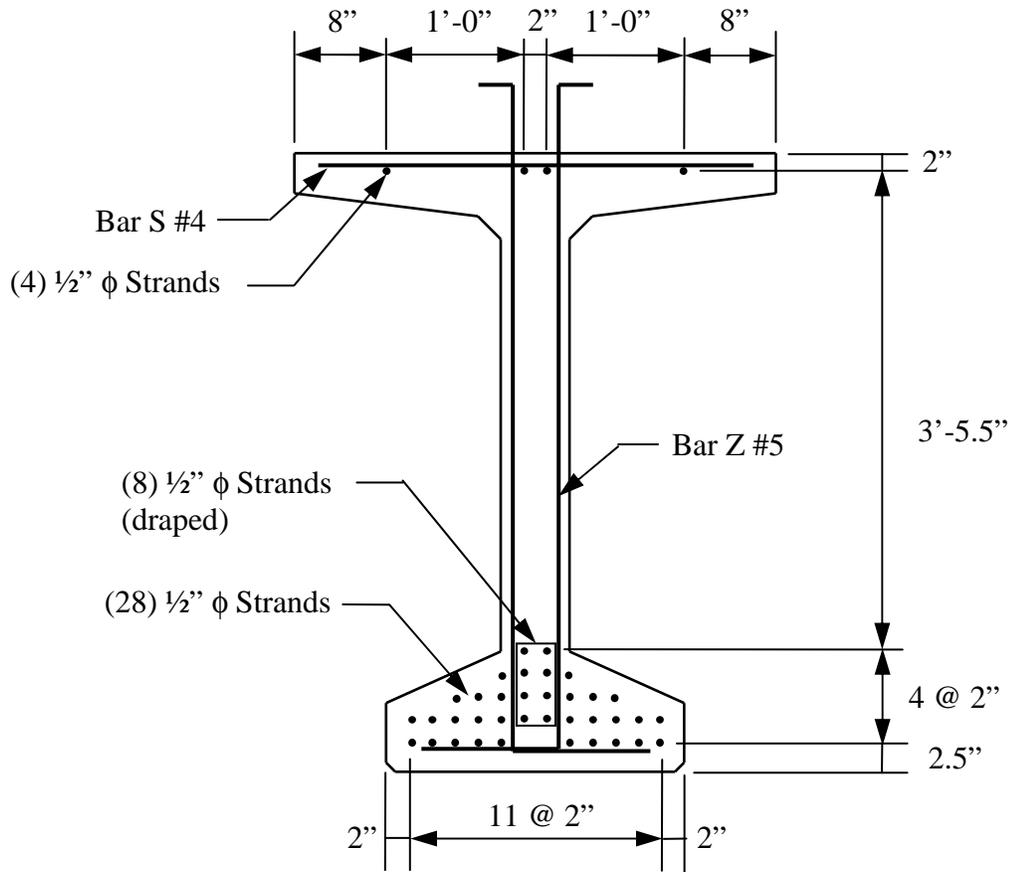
Mild Steel and Strand Arrangement for BT-54 Girder at Midspan
